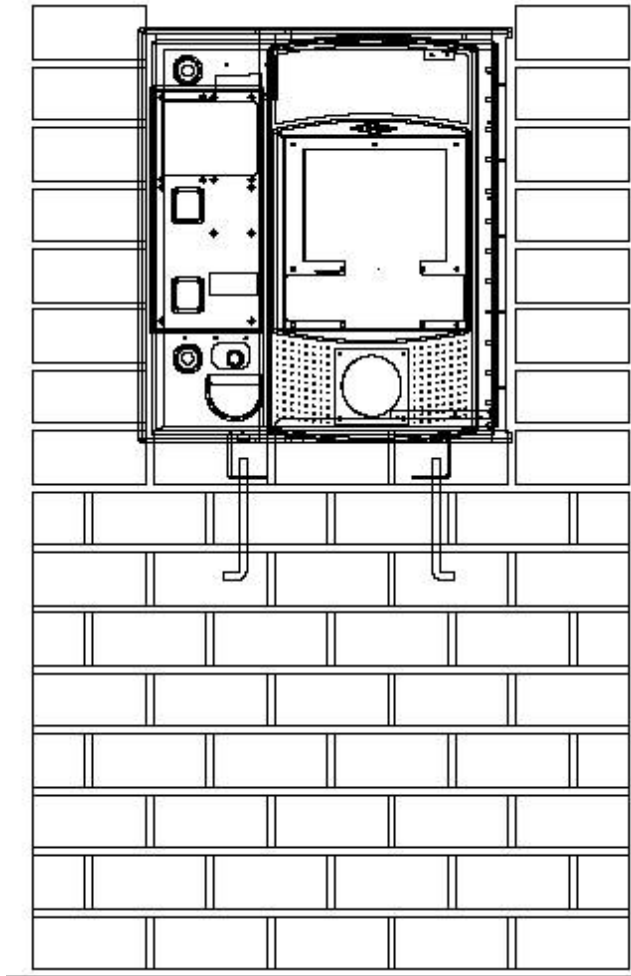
Bricked-In Portal TI with Adaptor Plate and Mounting Bolts
